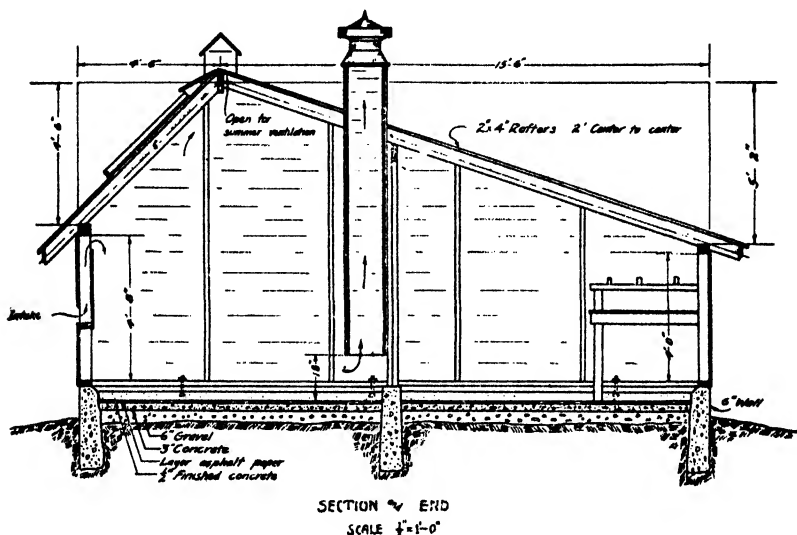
Cross section view of Michigan type poultry house, showing ventilator intake and outlet. Proper dropping board arrangement, and one satisfactory type of floor.
